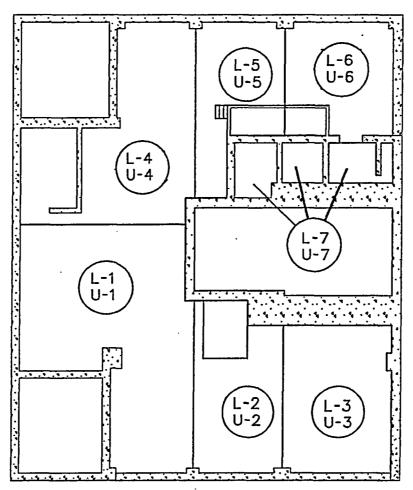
PATHFINDER FUEL HANDLING BUILDING MEZZANINE SURVEY UNIT LOCATIONS
